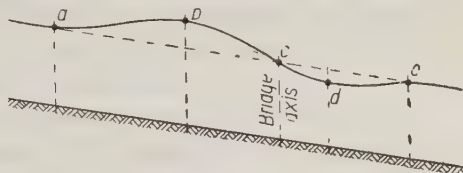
Longitudinal cross section of a river near the bridge before the scour:
